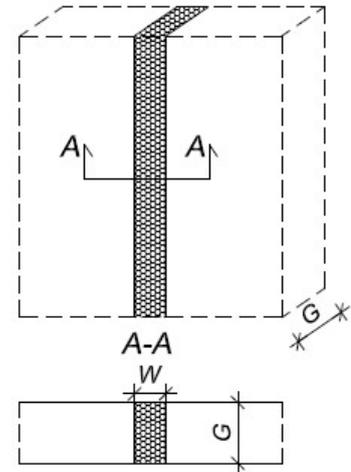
View and cross-section of the vertical linear joint seal in wall
